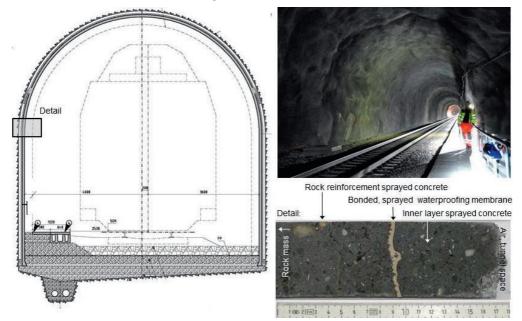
Innovative option for traffic tunnels in rock with sprayed concrete and bonded waterproofing membrane. Design and finished lining from the recently constructed Gevingås rail tunnel in Norway
